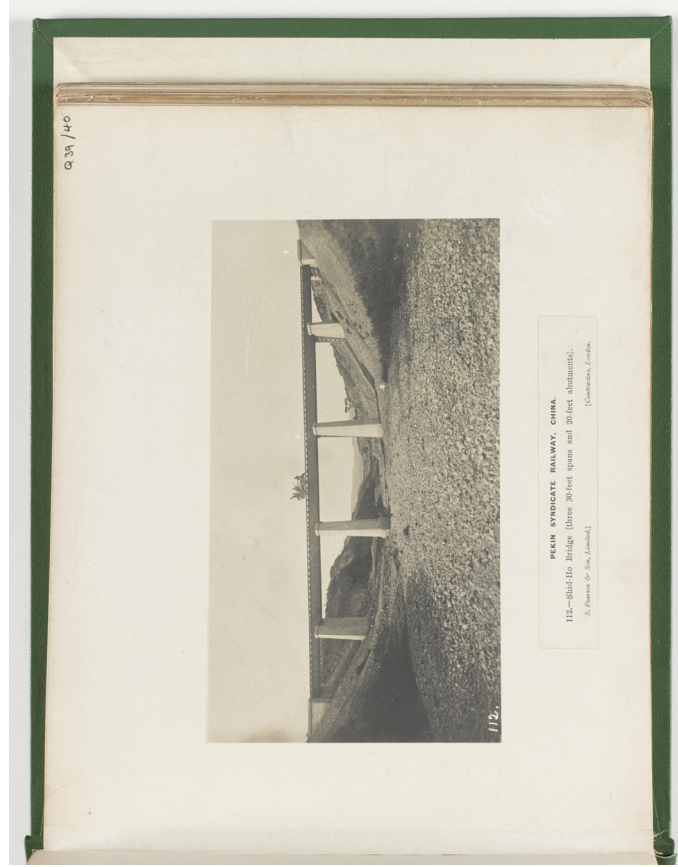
Unknown author, “Shid-Ho bridge (three 30-foot spans and 20-foot abutments)”
